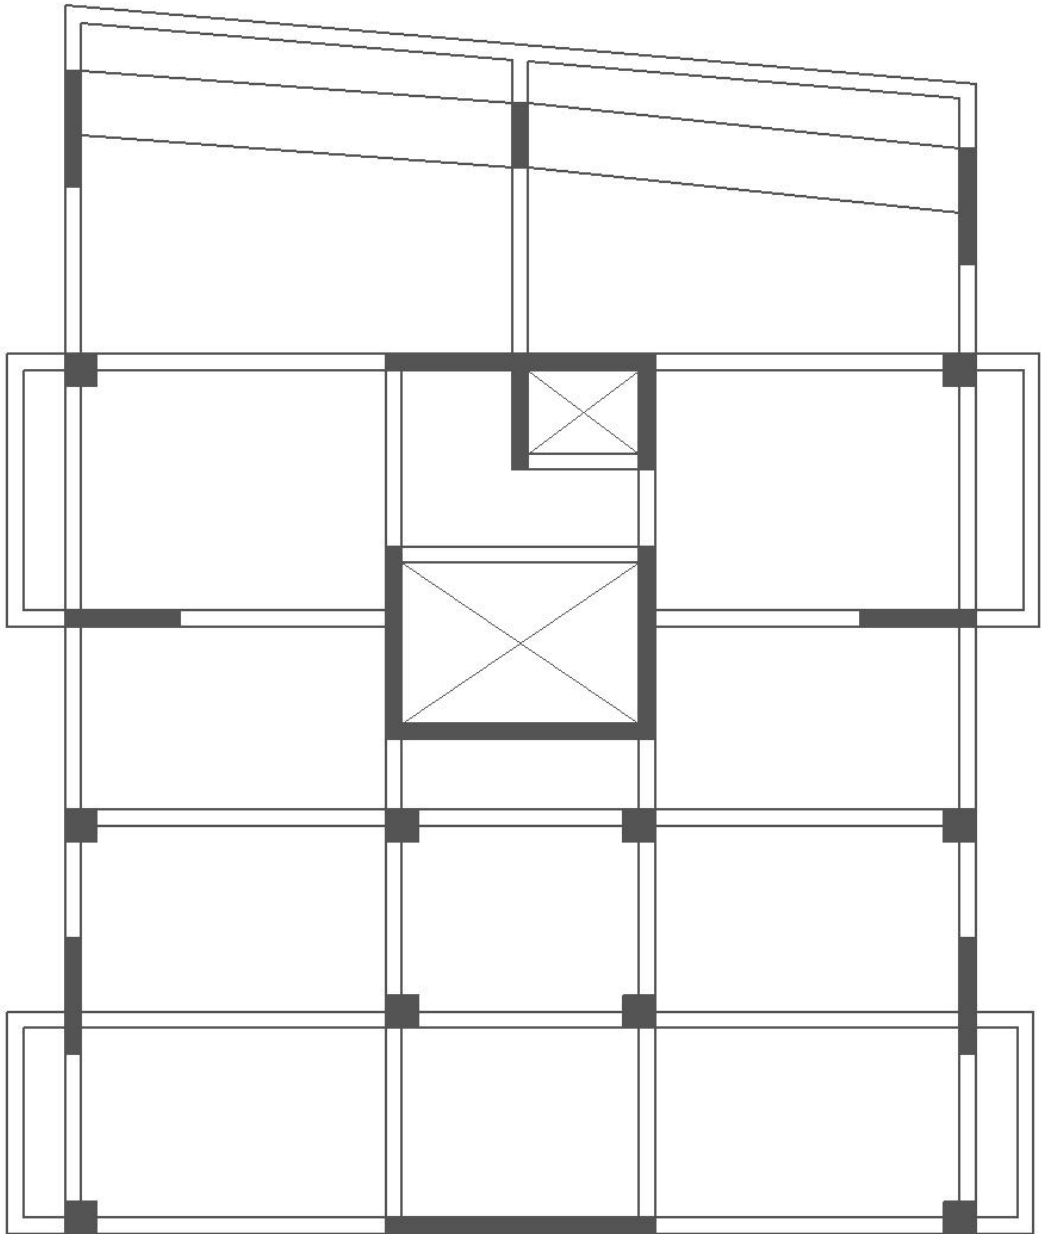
Structural Plan of Model-1 with Regular Structural System
